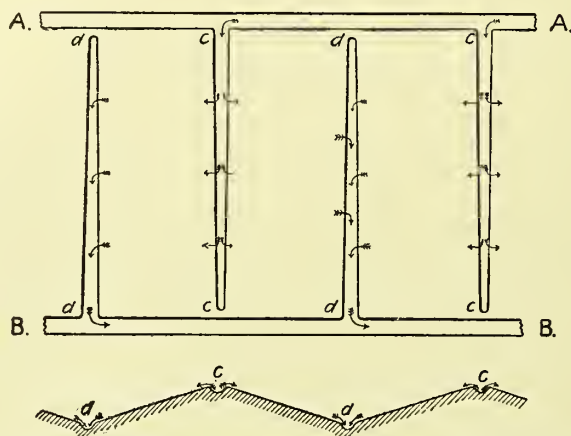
PLAN AND SECTION OF RIDGE AND FURROW SYSTEM.
